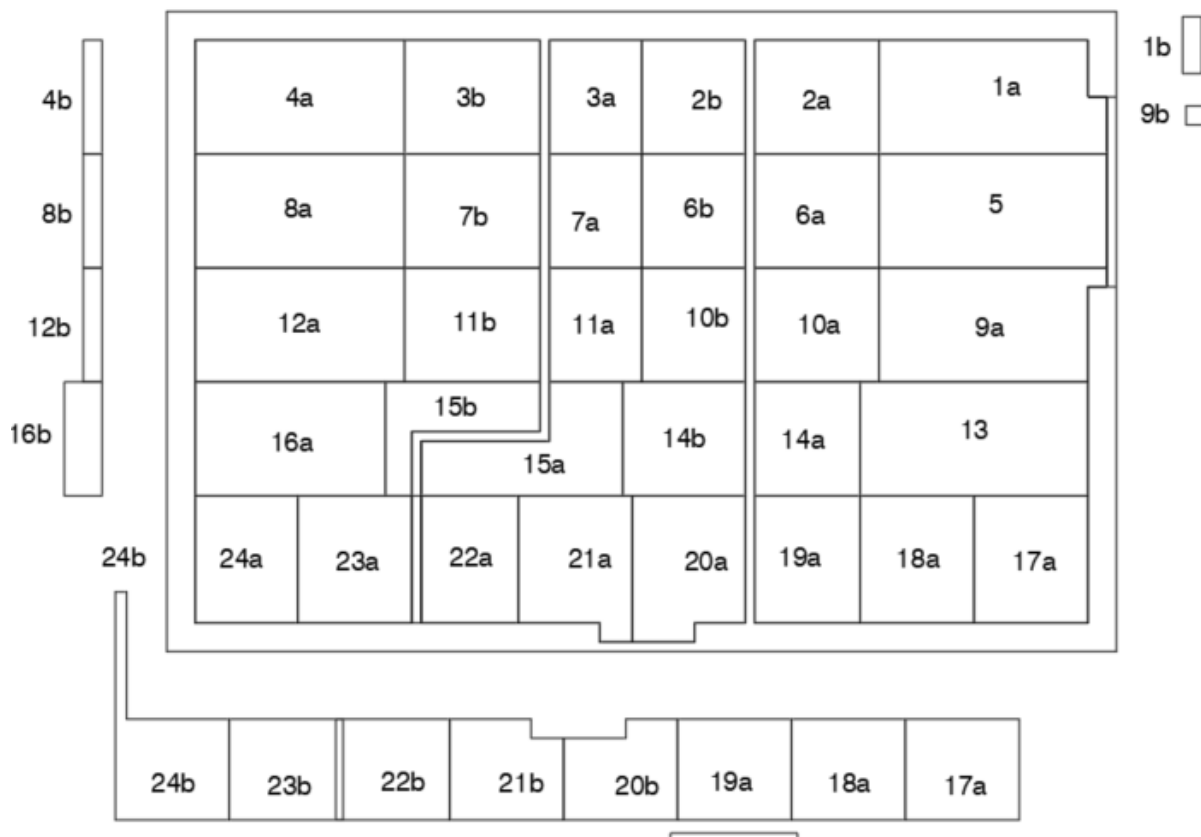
Top sheet laid parallel to beam span with maximum full sheets laid first
